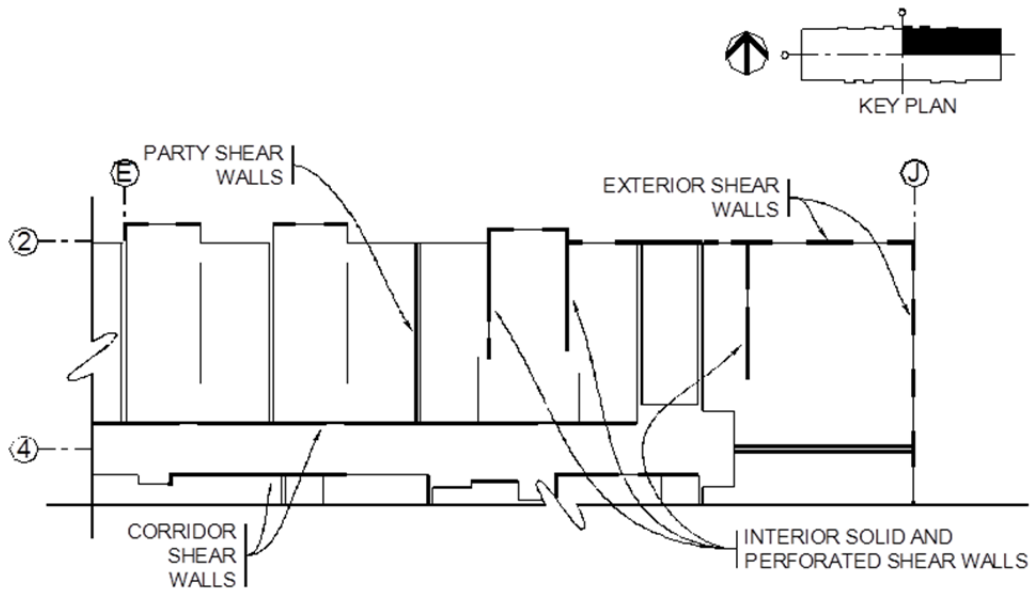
Plan of shear walls (northeast corner) for current national seismic code design.
